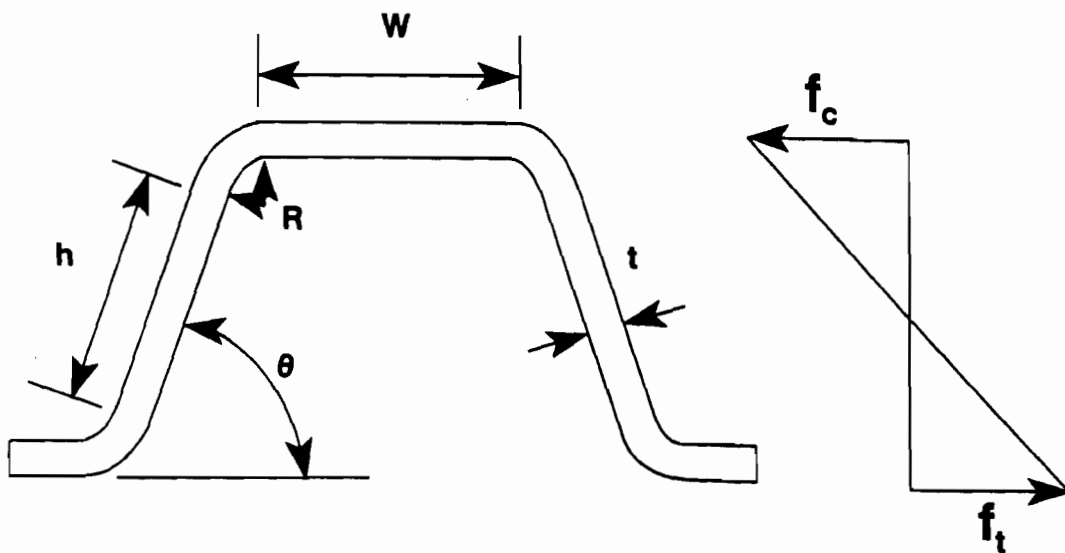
Cross Section Used for the Design of Panel Specimens
